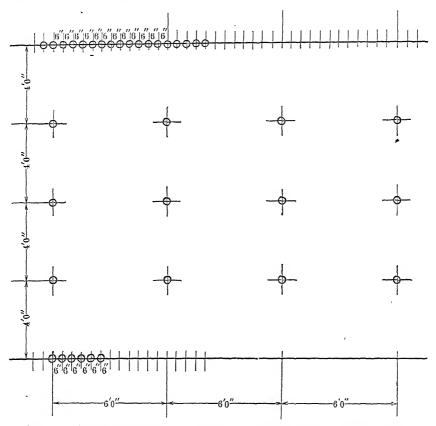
Approximate Spacing of Holes in Trench for Dam Footing.
